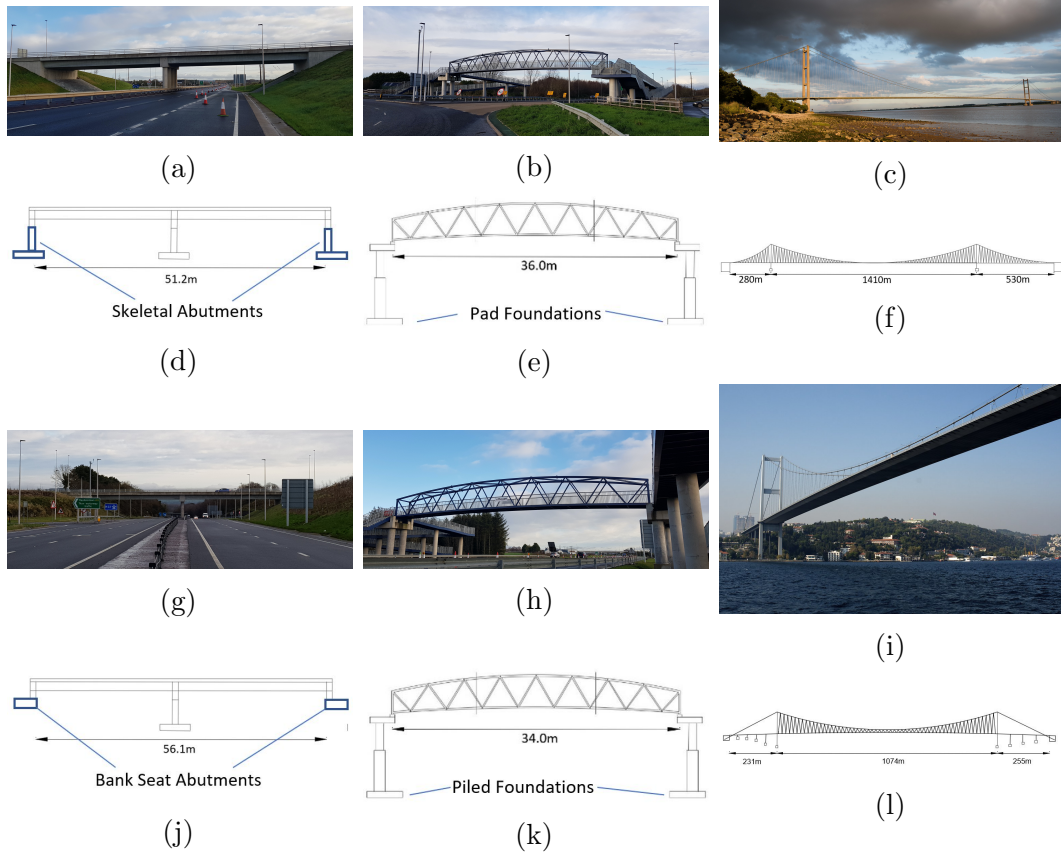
Three of the original bridges from Section 3 and the corresponding three comparator bridges (a) original beam-and-slab bridge, (b) original truss bridge, (c) original suspension bridge, (d) elevation of original beam-and-slab bridge, (e) elevation of original truss bridge, (f) elevation of original suspension bridge, (g) comparator beam-and-slab bridge, (h) comparator truss bridge, (i) comparator suspension bridge, (j) elevation of comparator beam-and-slab bridge, (k) elevation of comparator truss bridge, (l) elevation of comparator suspension bridge. Sub-figure (i) is titled “Boğaziçi Köprüsü / Bosphorus Bridge” by Jun Seita and is licensed under CC BY 2.0.
